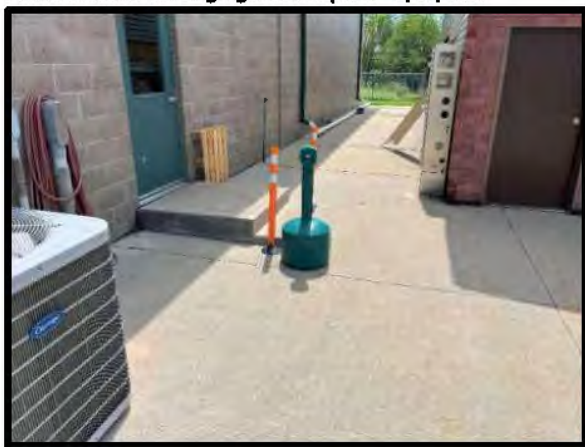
Southwest Garage East Siding Damage – 8/15/2024
